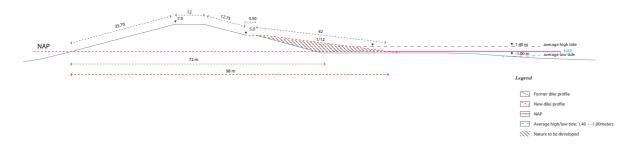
Existing situation of dike profile, including the proposed new profile
